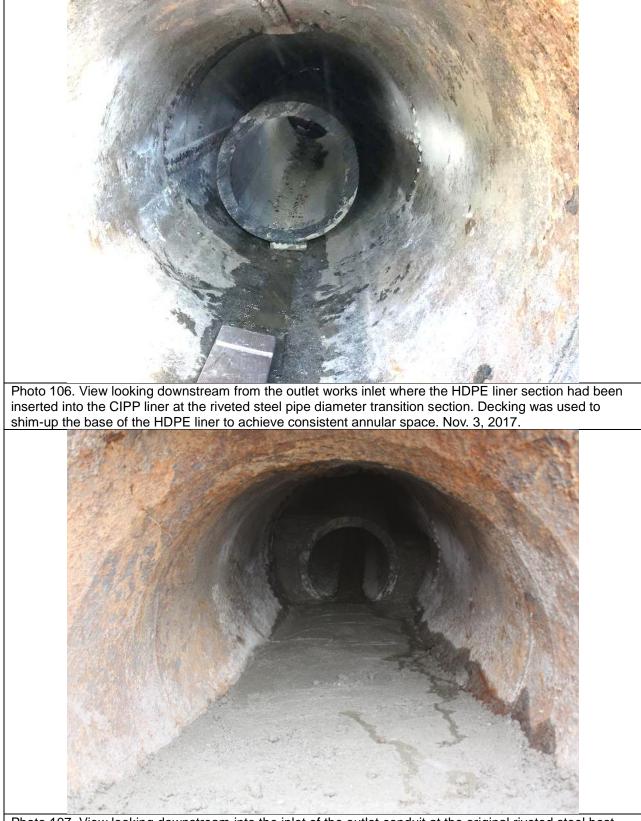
View looking downstream into the inlet of the outlet conduit at the original riveted steel host pipe transition section which had been filled in along the bottom up to the invert of the HDPE liner pipe with concrete. Nov. 4, 2017.
